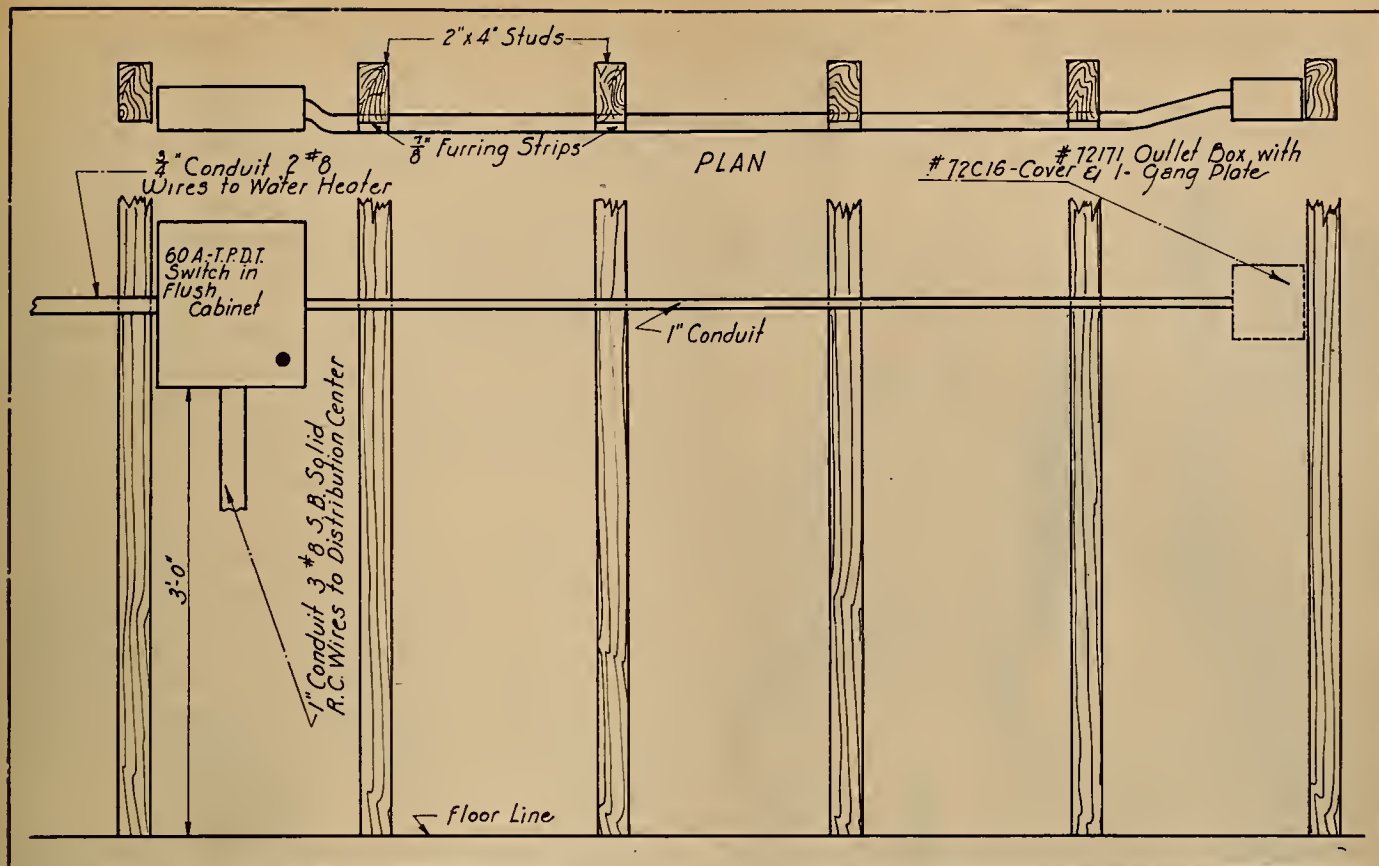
Construction detail of range and water heater flush switch with junction box.
